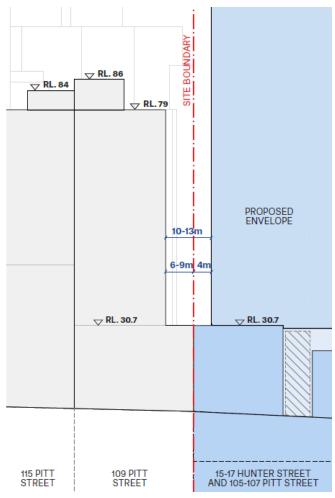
Building separation to 109 Pitt Street incorporating the proposed 4m tower setback
